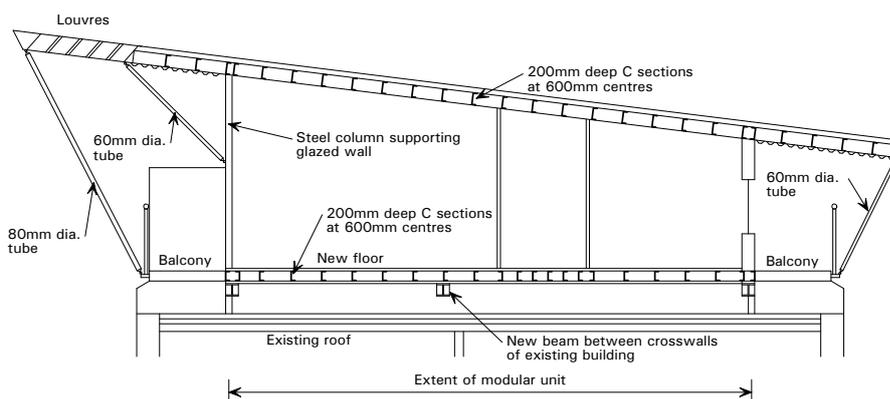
Cross-section through over-roofing scheme in Copenhagen
